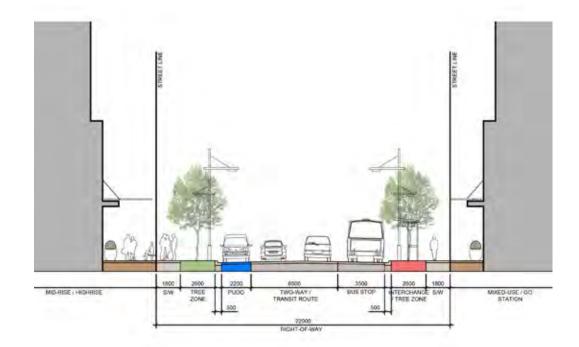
22.0m Major Collector Road ROW - Transit Street
